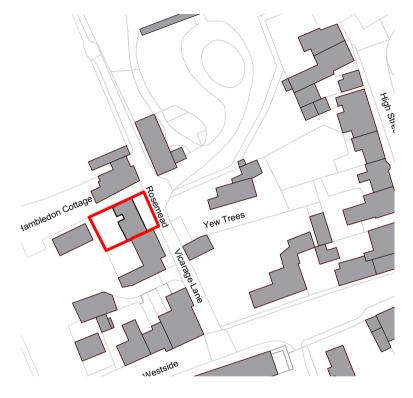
Existing Site Location Plan of Rosemead Cottage
